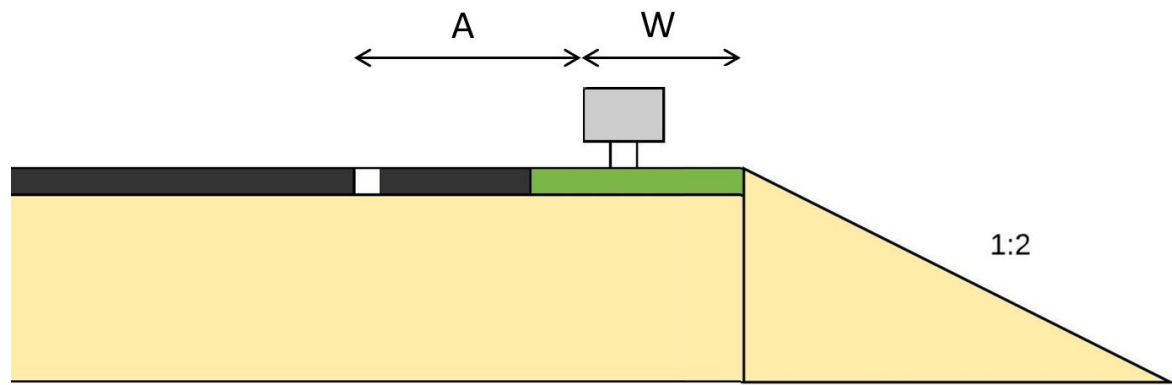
Cross-section of the embankment without emergency lane.[8]
